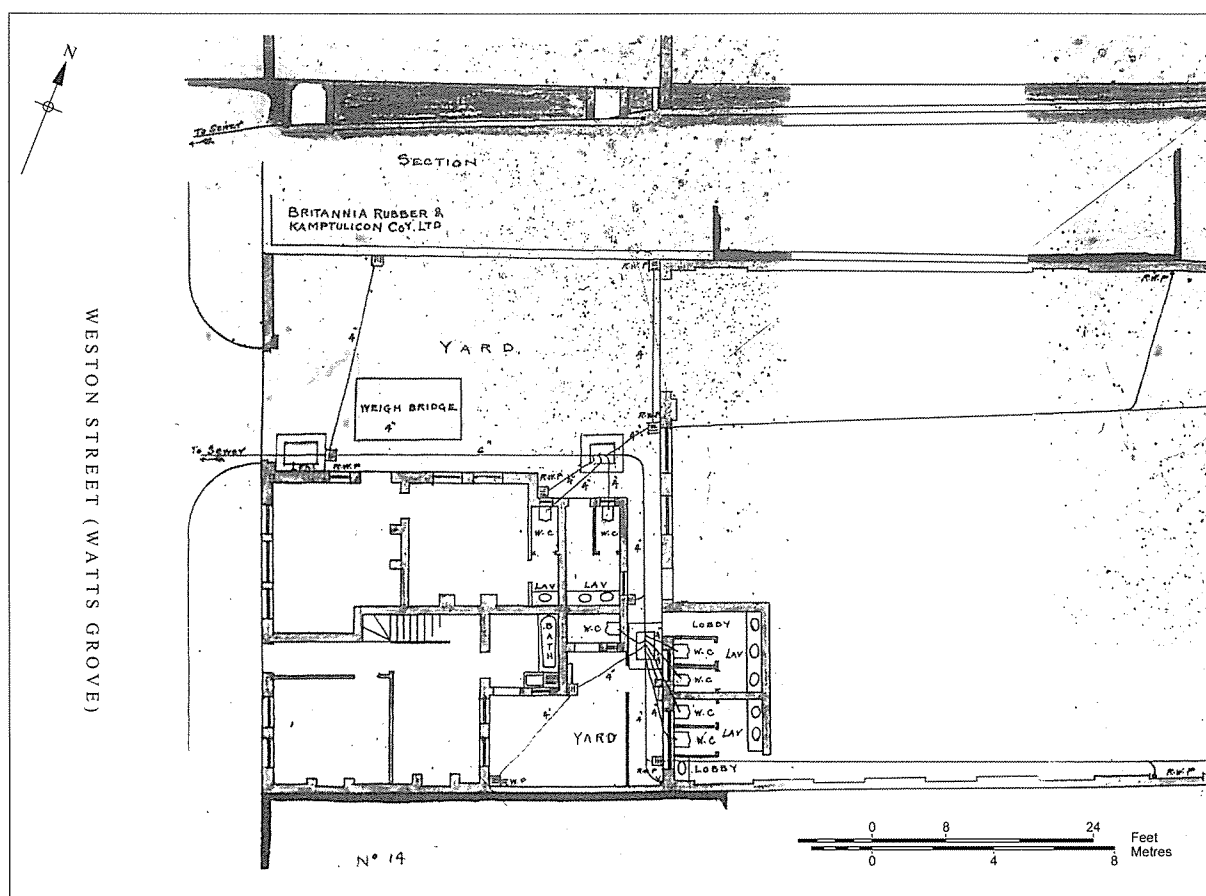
Drainage plan of the Sanitas factory, Weston Street, 1914
